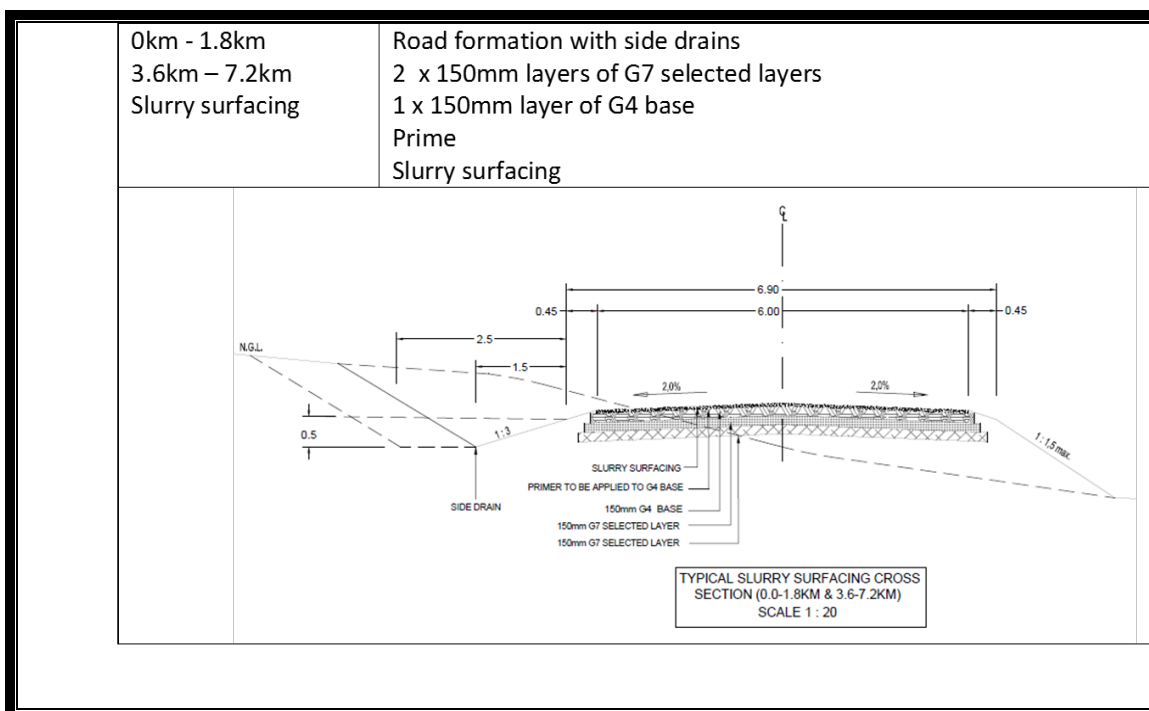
7. Road D1264 km 0.00 to km 1.800 cross section (Nankhoo, 2011)
